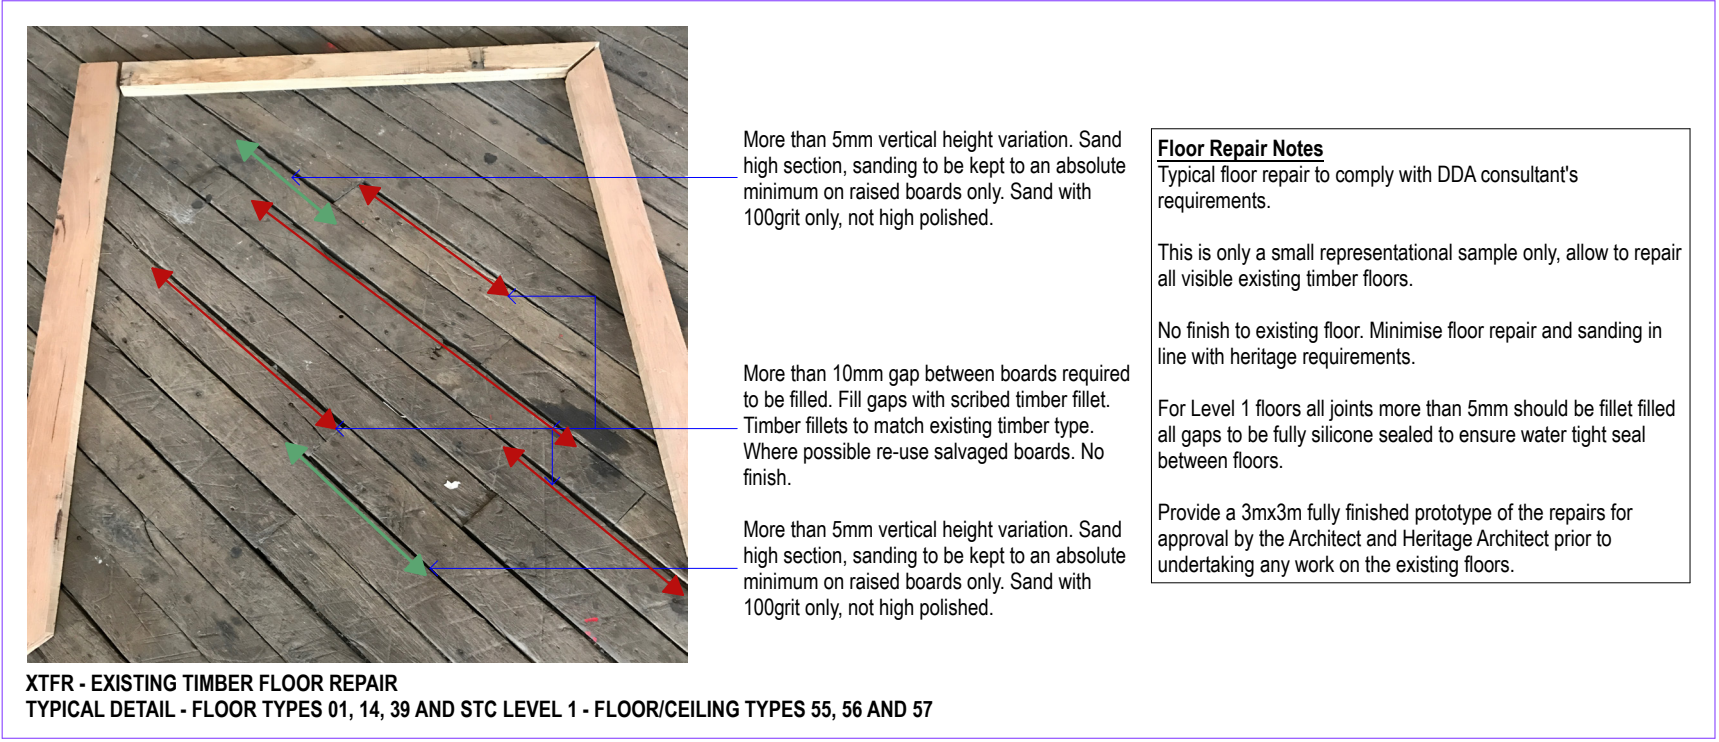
Proposed timber floor repair methodology - to comply accessibility requirements.
